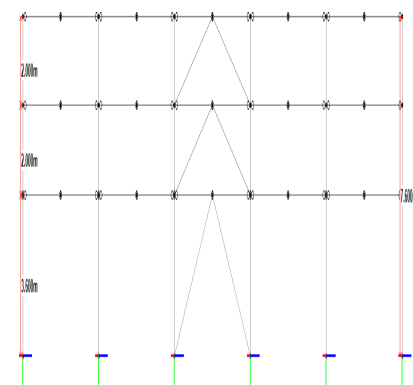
Side Elevation of G+2(3 tier) Piperack Structure
